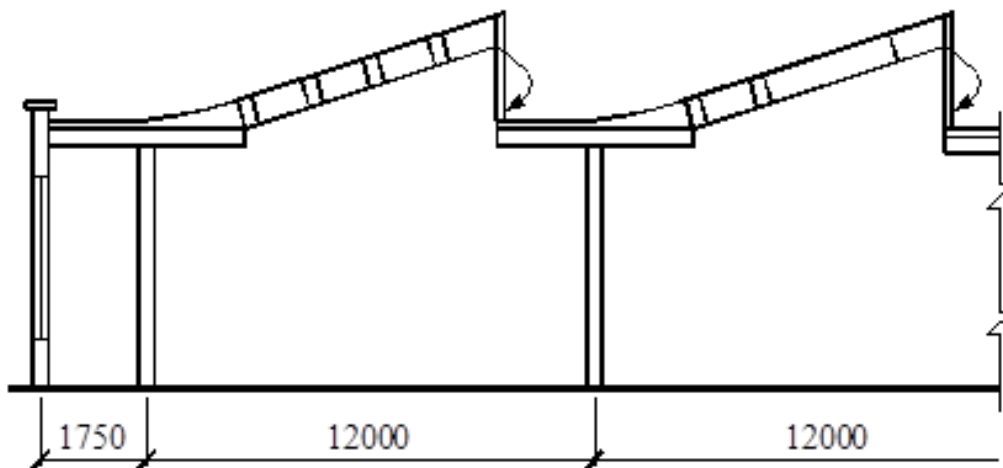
Building with a sawtooth roof (or shed roof)
